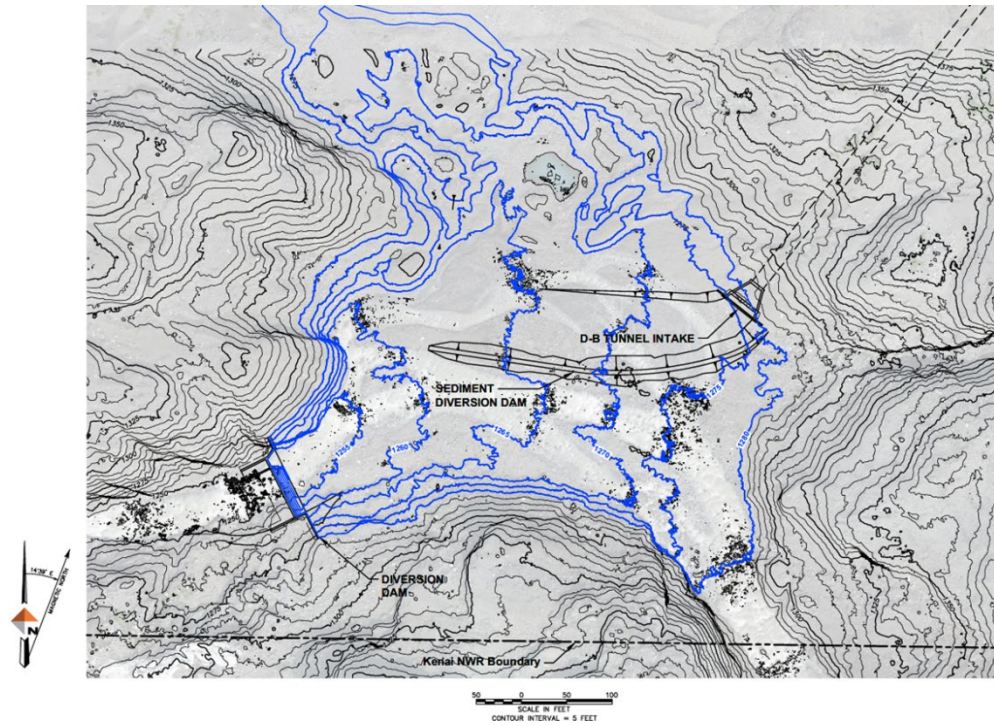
Conceptual design of diversion dam and tunnel intake (plan view)
